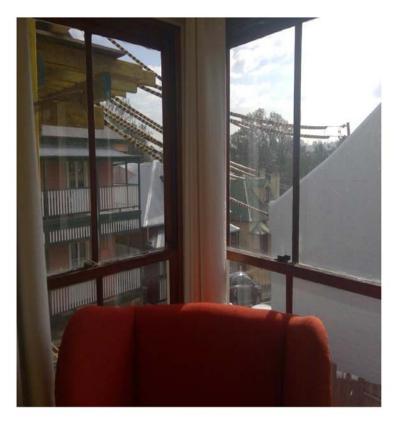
Existing ground floor level windows in the northern corner of the dwelling
